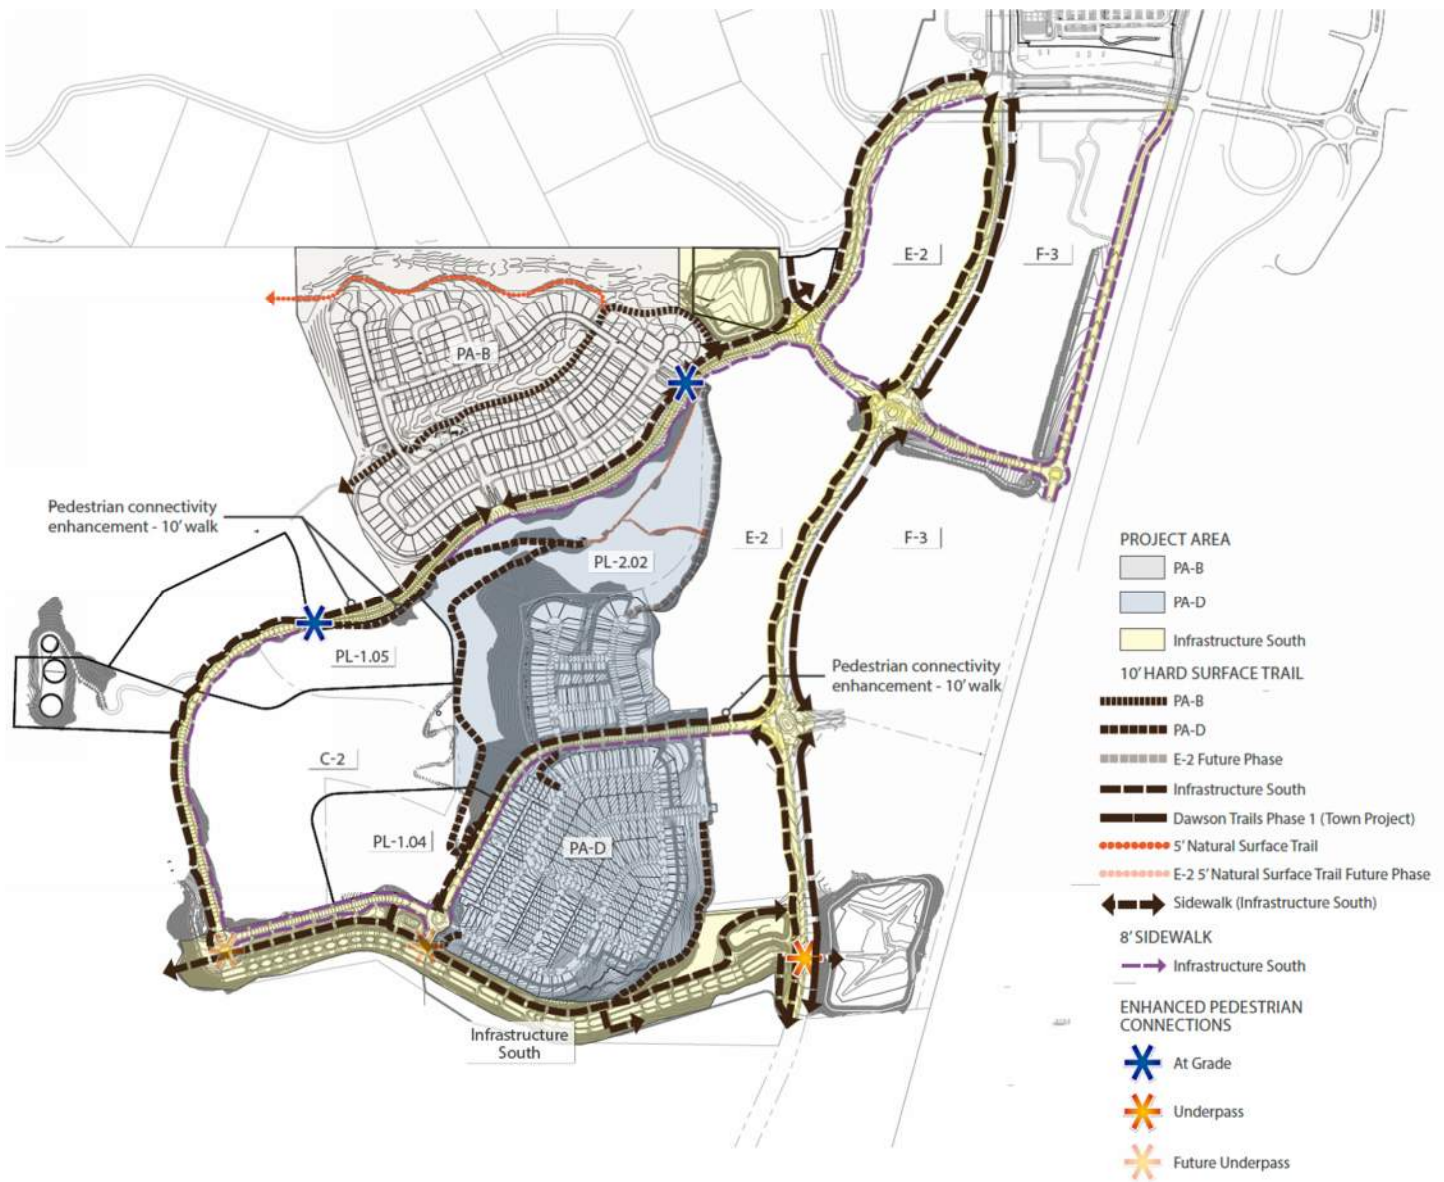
Proposed Multi-Modal Network for Planning Area E-2
